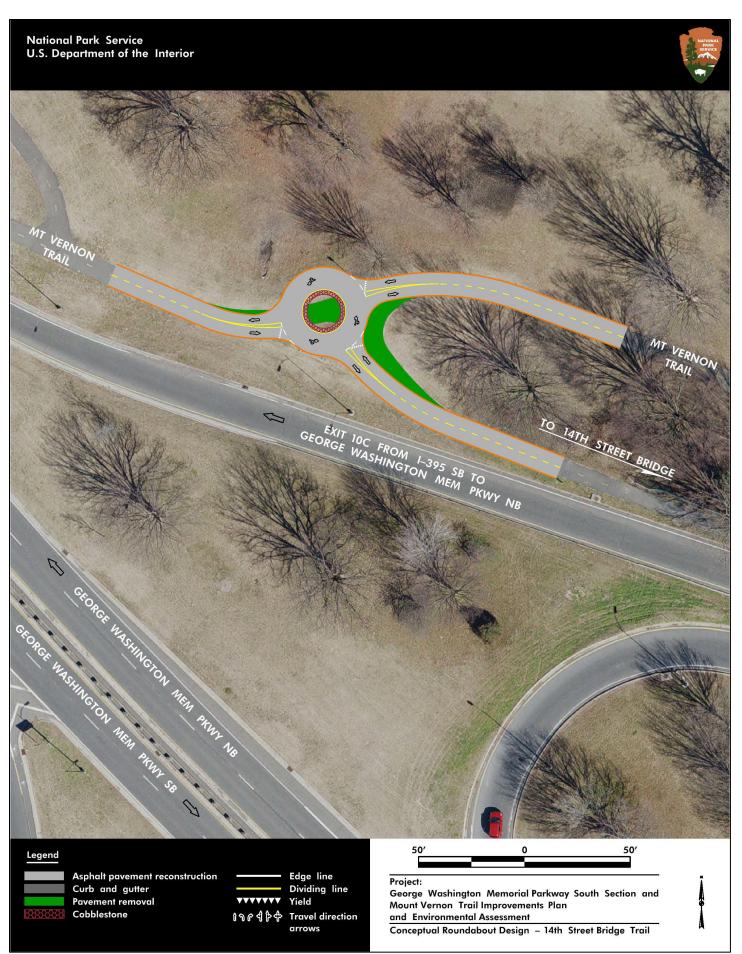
Proposed Roundabout Design – 14th Street Bridge Trail
